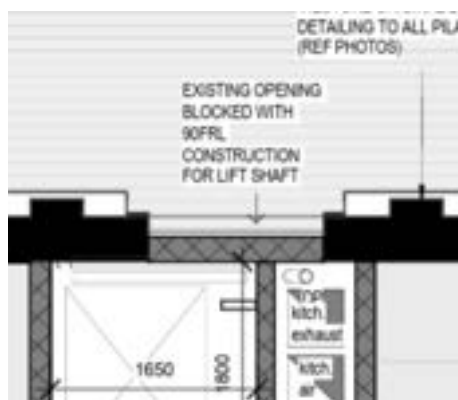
A3-103 Proposed first floor plan showing a southern infilled wall in the main hall R.1-04. Source: Trethowan Architecture, 2025.
